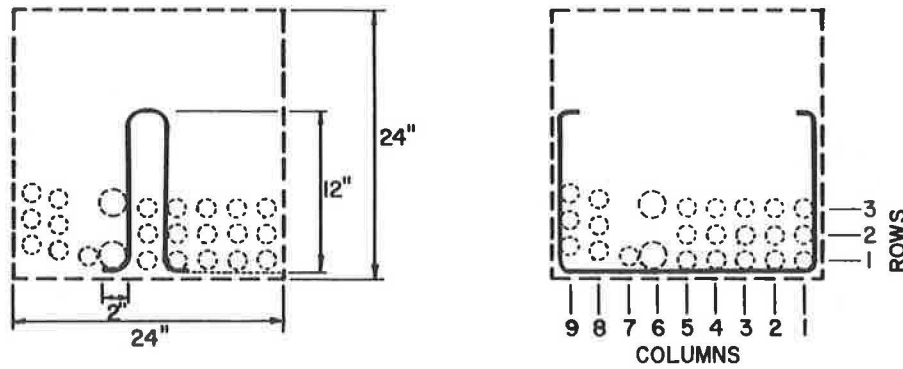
Concrete test beam sections showing U-type and rectangular-type stirrups.
